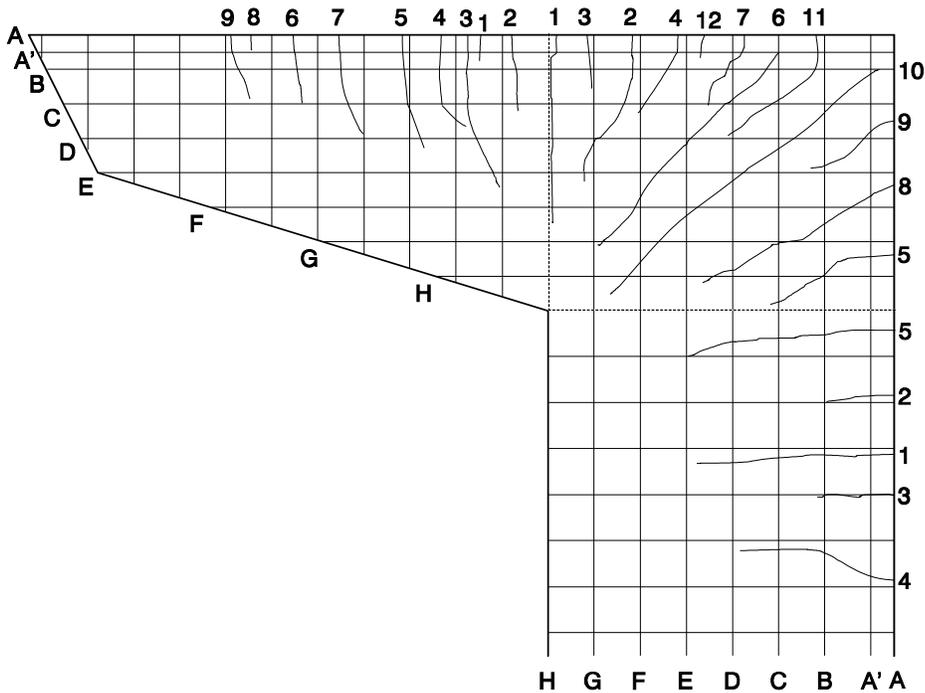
POJ-RC-100-TH cracking pattern on south face of specimen at service load
